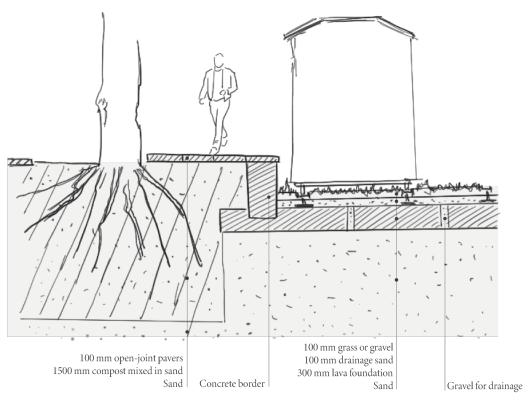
Section BB: Adding trees to the tram stop platforms and permeable surfaces between the tram tracks. Source: by author
